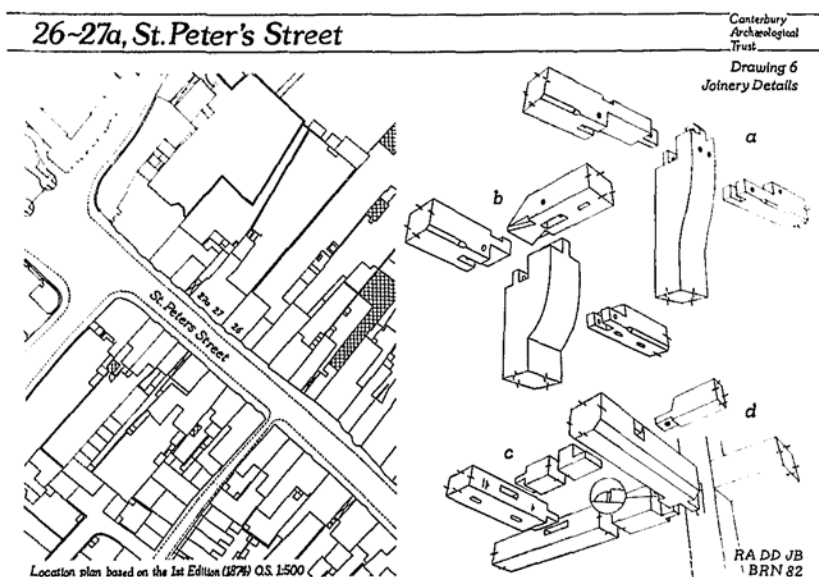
No. 26 St. Peter's Street: Location Plan (Scale: 1:2000) and Joinery Details (Scale: 1:40).
